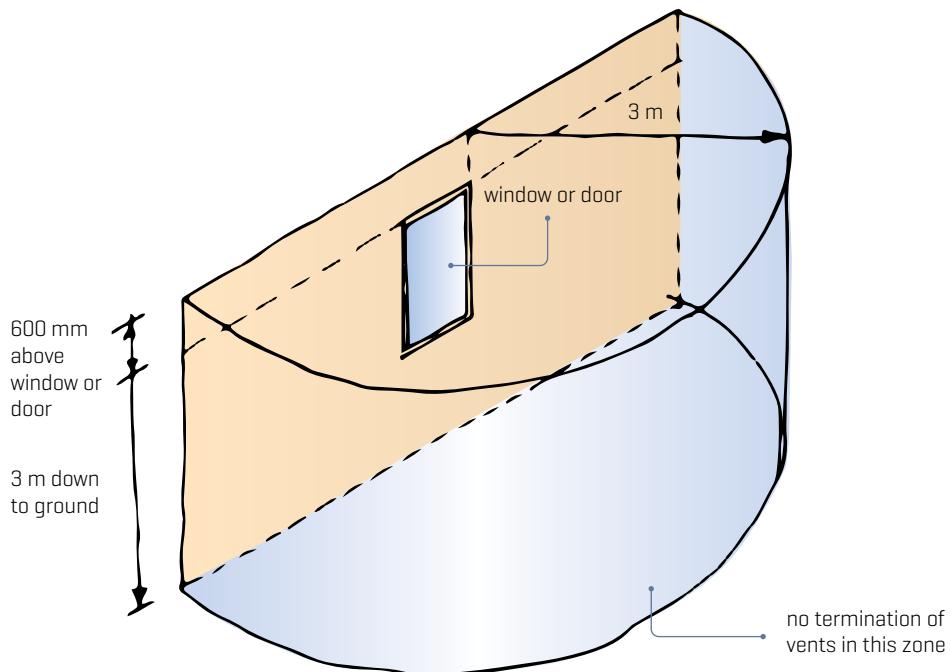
Termination point of vent 600 mm above and 3 m horizontally from a window, door or roof light.
